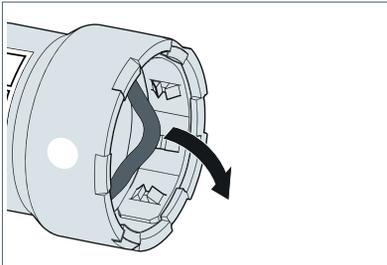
Removal of the sealing element from press connectors – up to 2 inches
